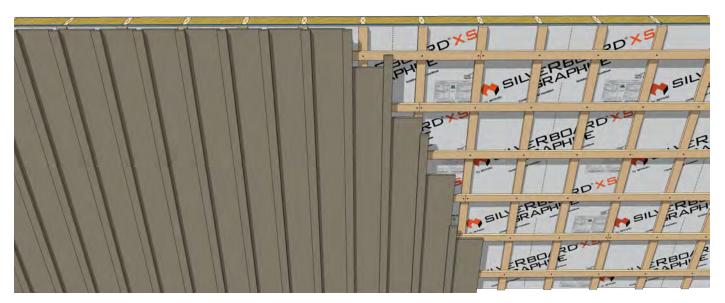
Vertical board and batten siding with rain screen double layer strapping on 1-1/8 (29mm) SilveRboard Graphite XS
